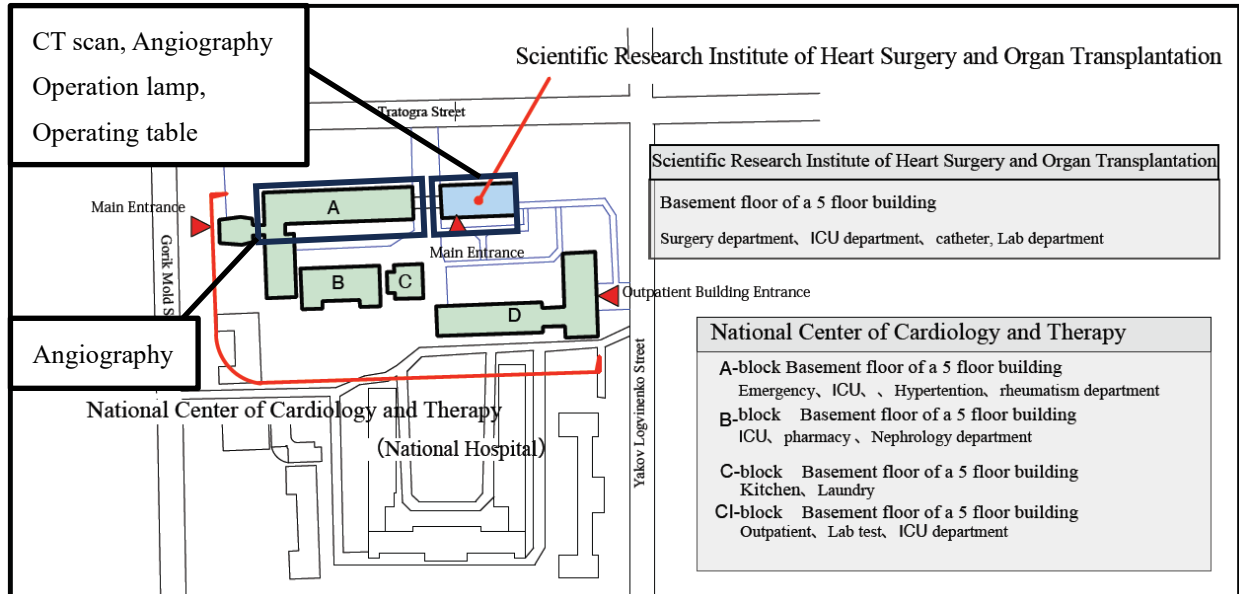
Site Plan (NCCIM and SRIHSOT)
